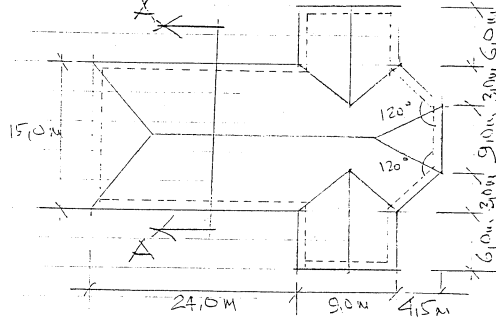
Roof Plan (Not to scale) - illustrates the roof plan of a Church Building. Assuming the cladding material is corrugated aluminium sheets:
